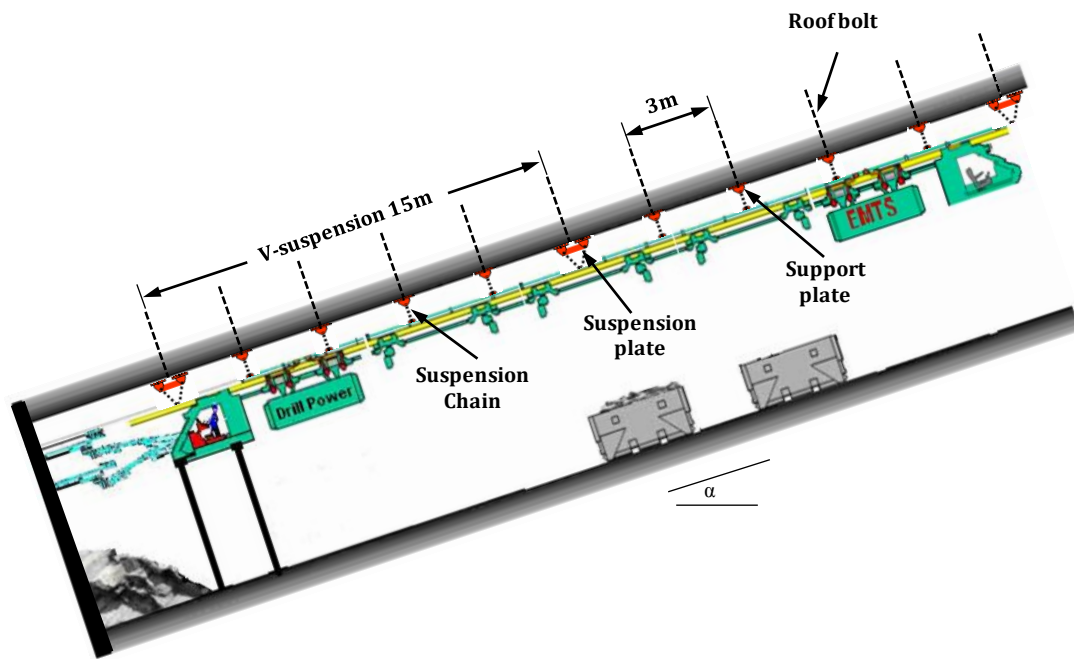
Drilling of roof bolt support holes for monorail installation (Scharf, 2007)
